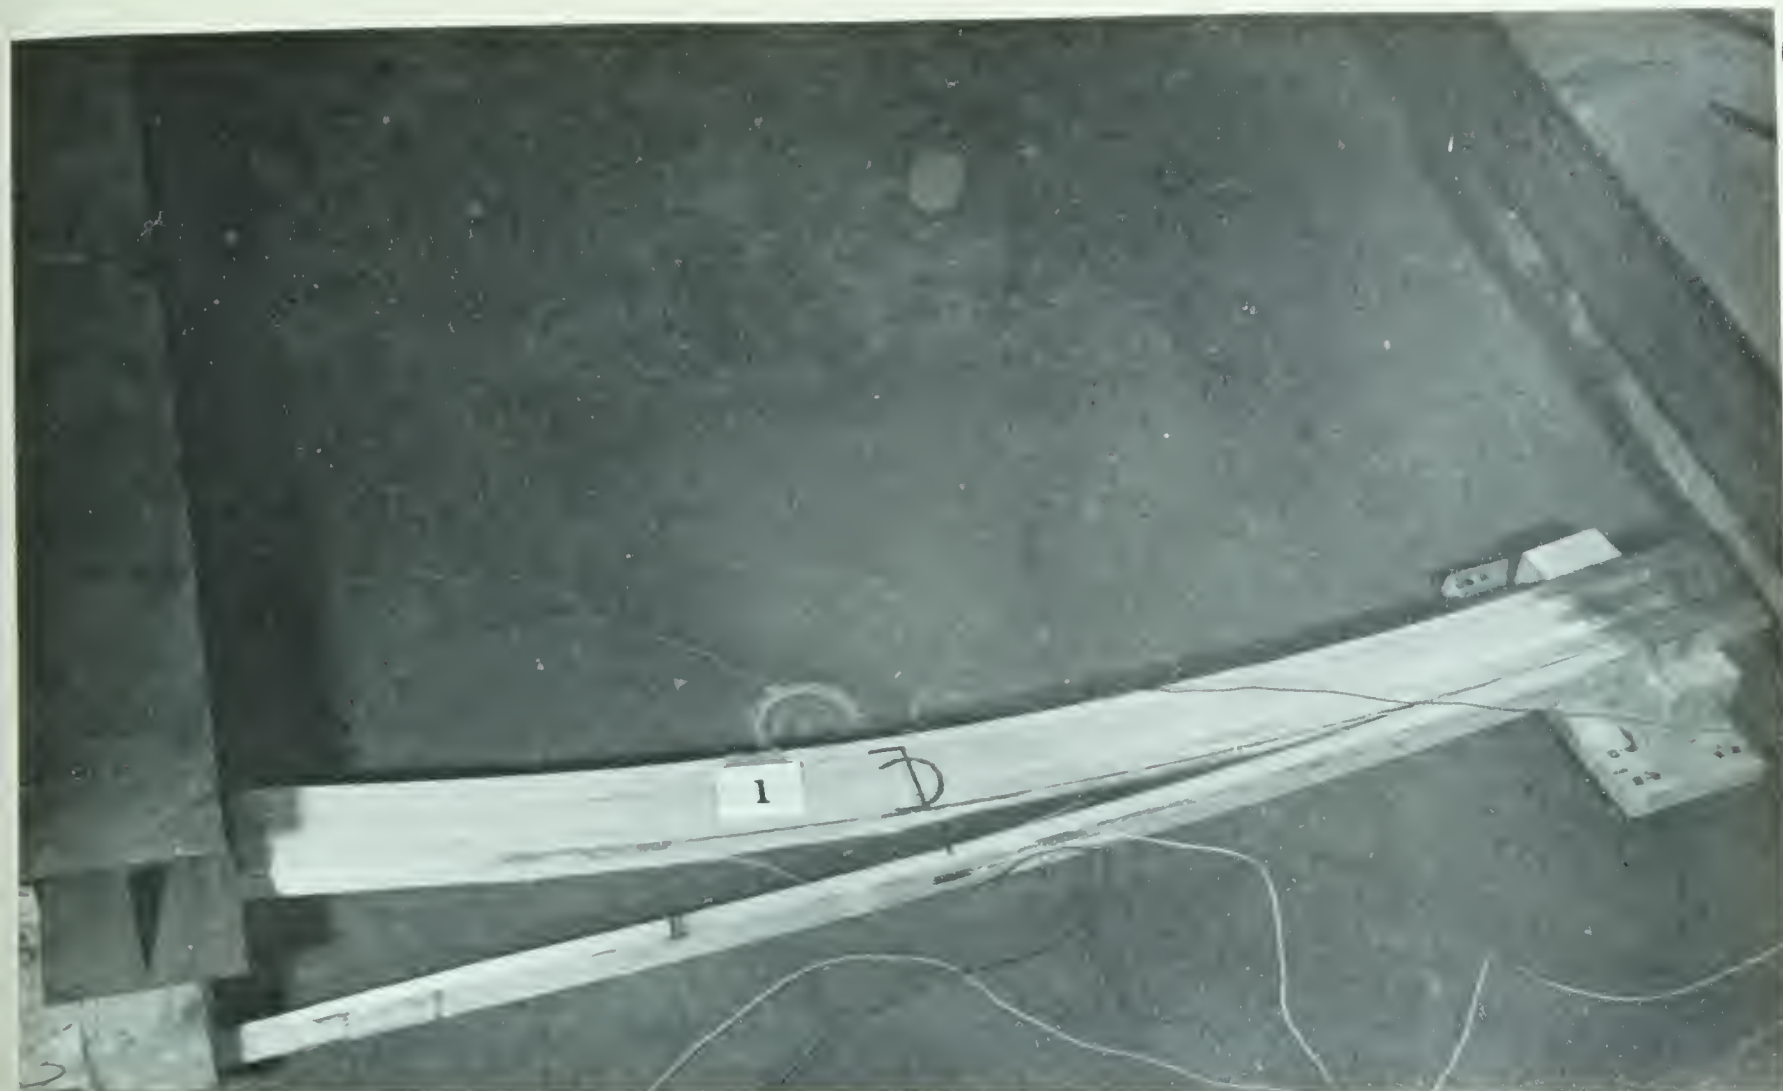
View of Failure in Arch Specimen No. 1.
